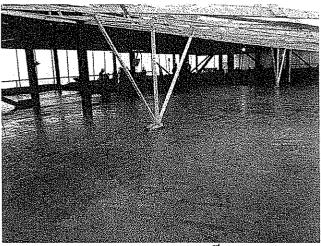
Concrete in place on the 3<sup>rd</sup> floor of the Classroom Wing. December 30, 2011.
